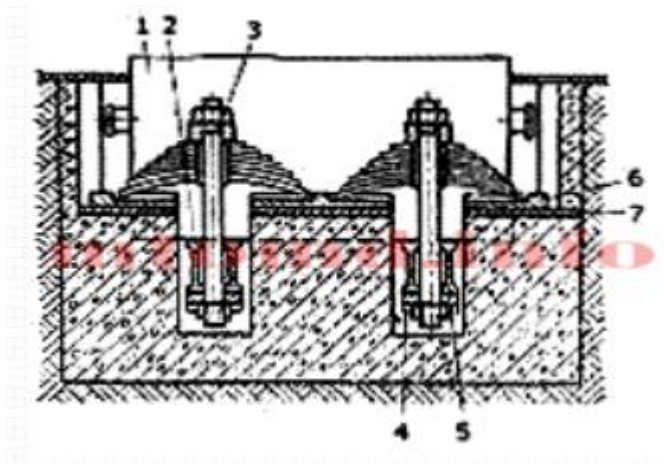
Vibroisolated foundation: 1 – chabotte; 2 – beam; 3 – rod;
